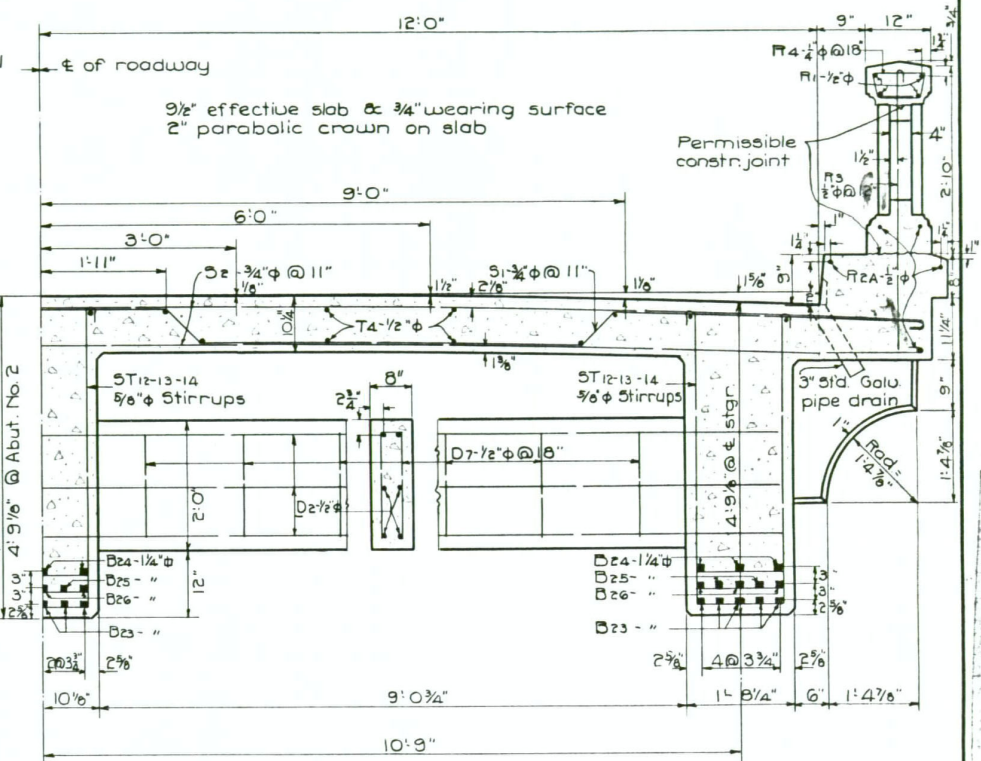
DETAIL OF OUTSIDE STRINGER - SPAN NO. 8 - LOW SIDE
